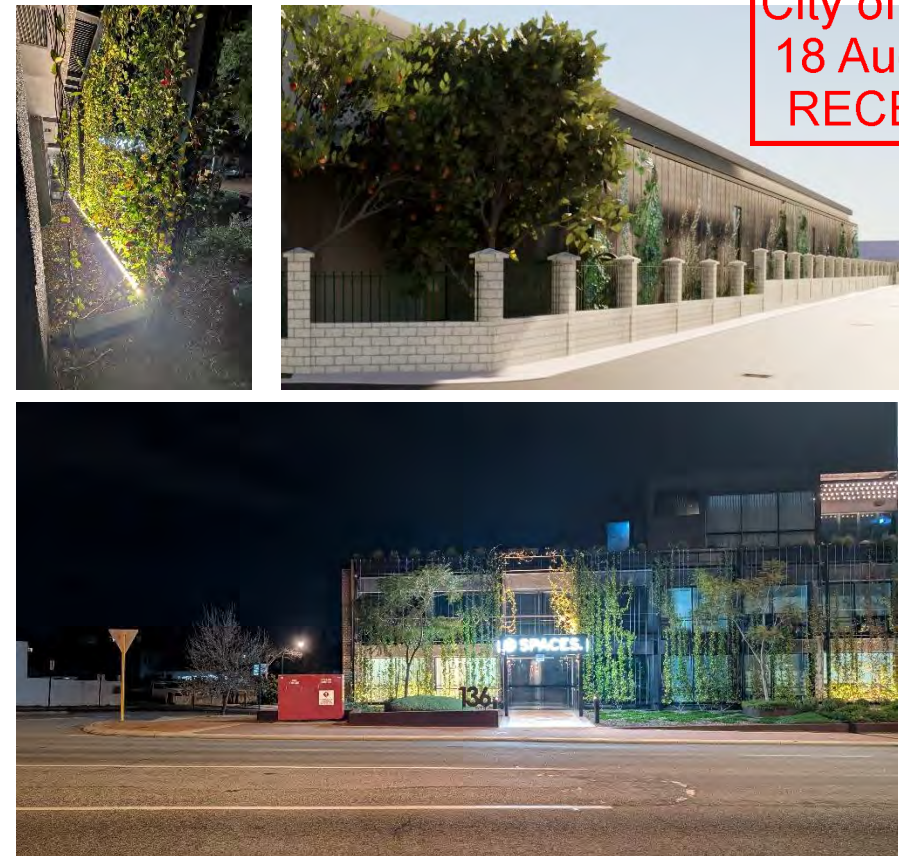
Proposed lighting arbour along the eastern elevation facing Adriatic Lane to resemble the installation found at 136 Stirling Highway, Nedlands.
